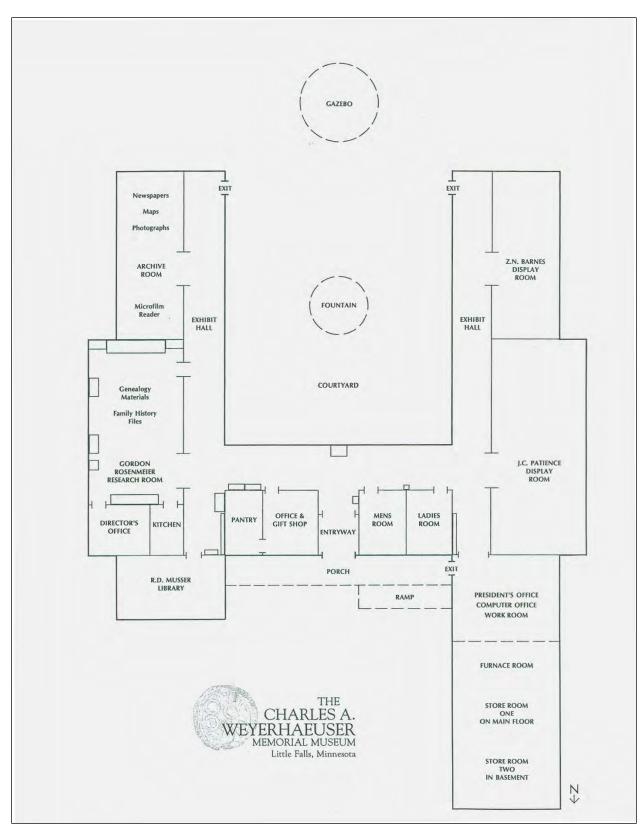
WEYERHAEUSER MUSEUM, CURRENT FLOOR PLAN
